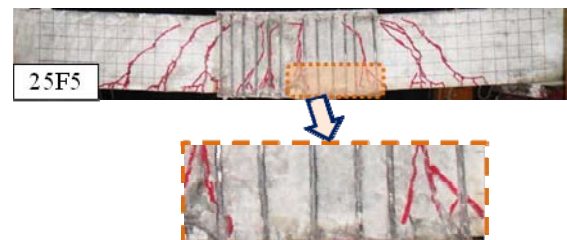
Crack pattern of specimen retrofitted by ferrocement jacket with skeleton steel (observed on main beams)
